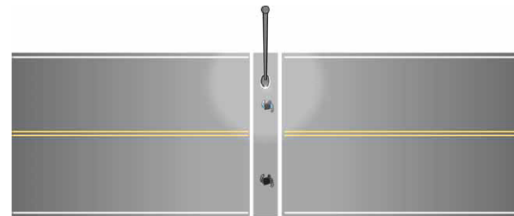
Drawing. Traditional midblock crosswalk lighting layout.
